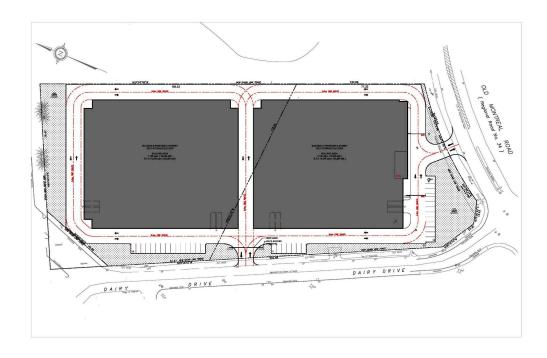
Site plan iteration with slightly different building footprint and additional parking.
